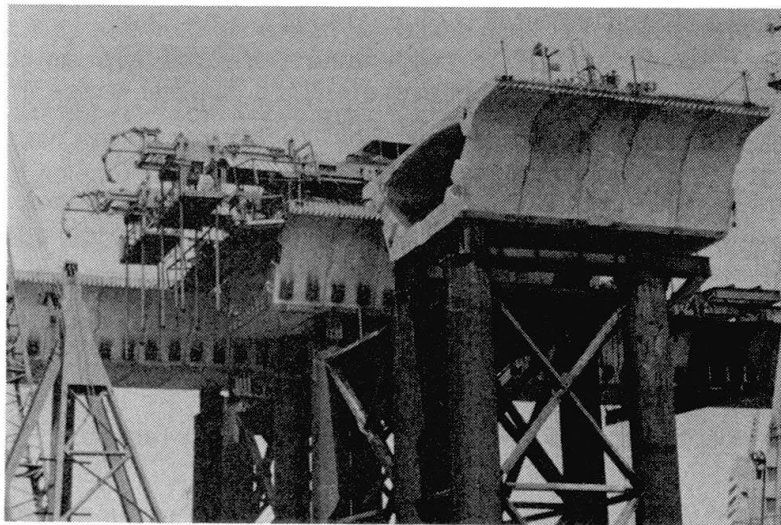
South Bridge - Segmental in progress. One typical precast segment "K" placed in the superstructure.
